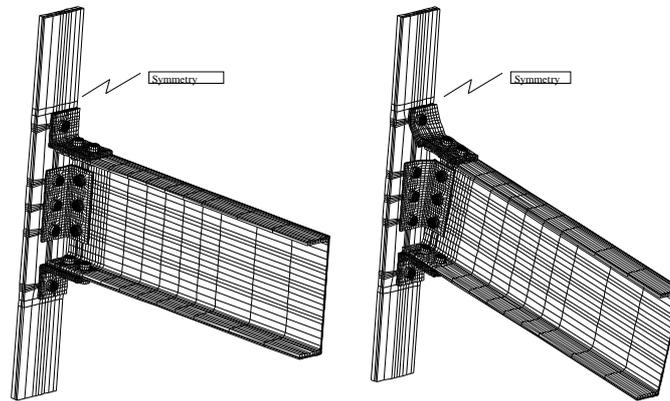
3D finite element connection model, deformed and undeformed shape.
